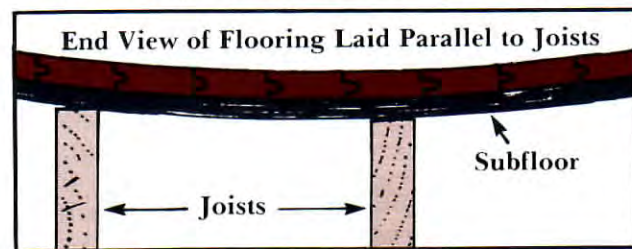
When surface floor is installed parallel to joists, depressions or swales like this may result.
